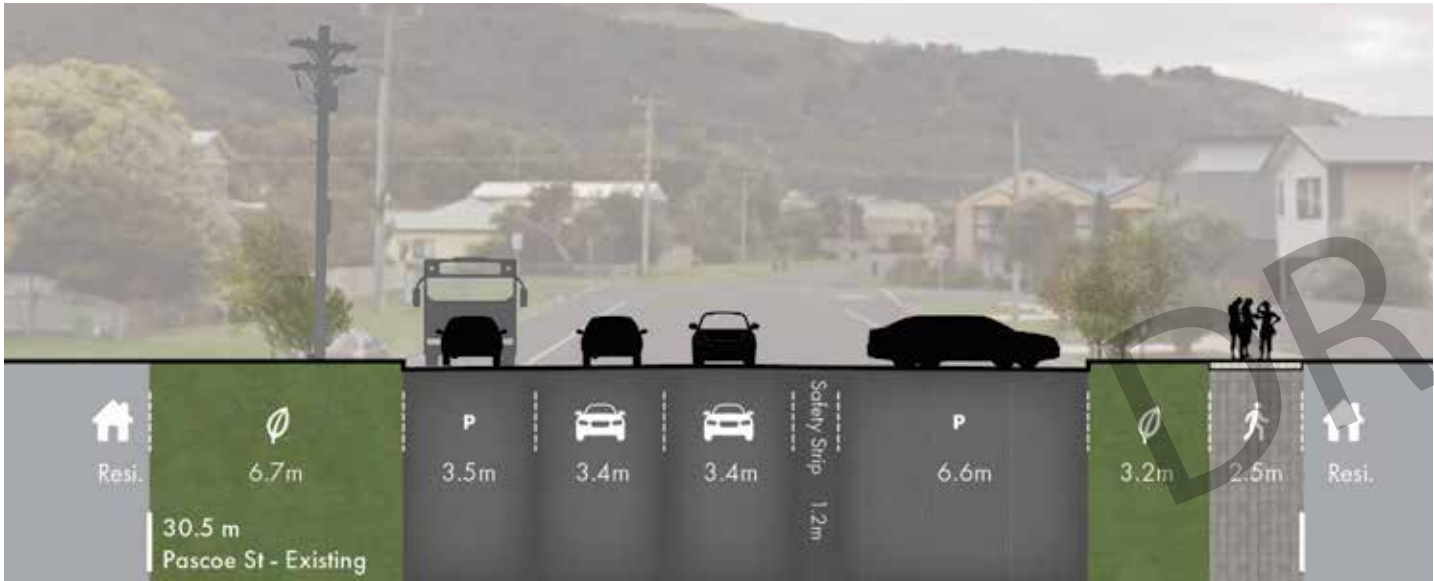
Pascoe Street C-C' (Between Thompson St And Hardy St) - Existing Cross Section
